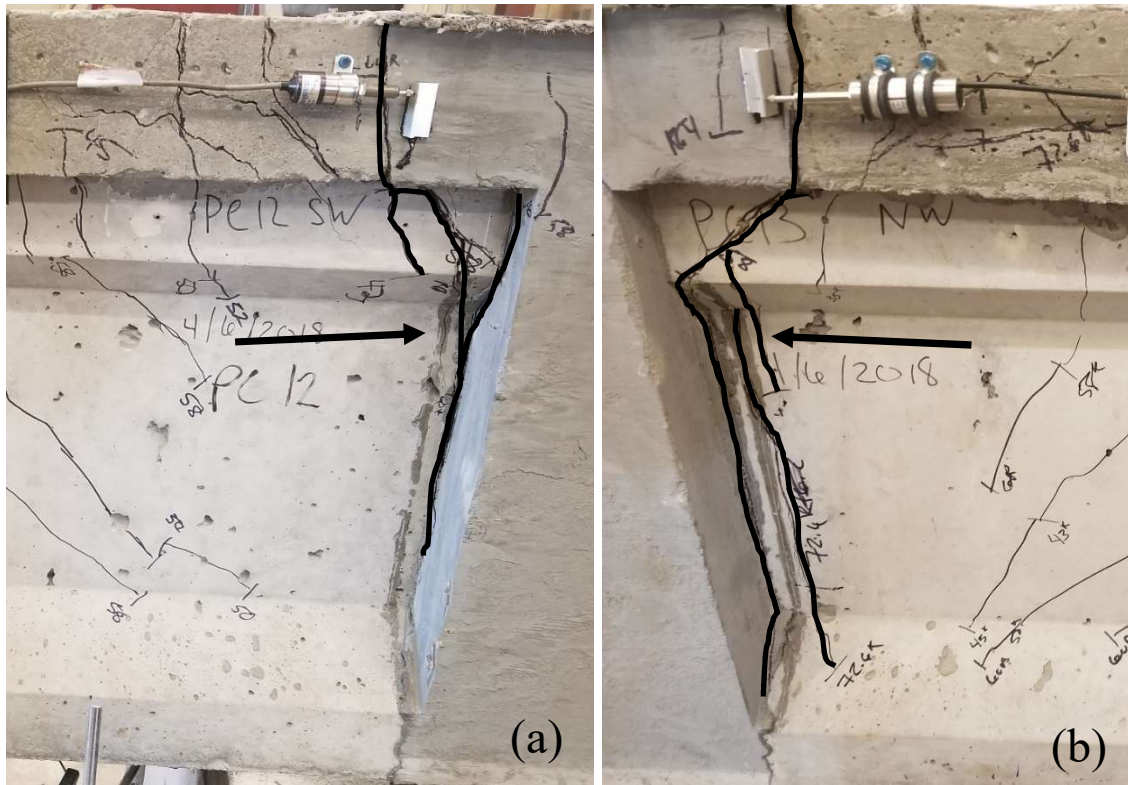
Joint separation at the interface between the NC1-N girder and the UHPC joint (a) and flexural cracking parallel to the interface between the UHPC joint and the NC1-S girder (b) are indicated by dark lines.
